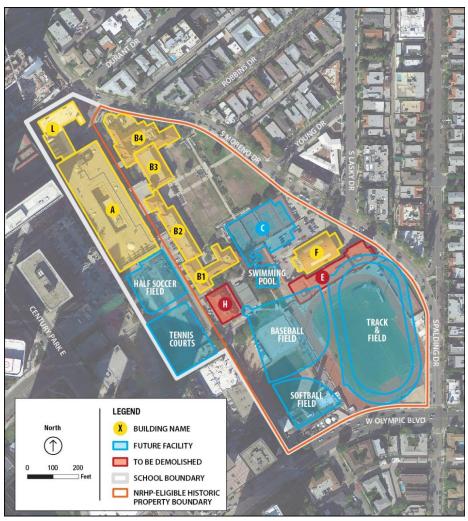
Proposed Changes to BHHS included in Master Plan
